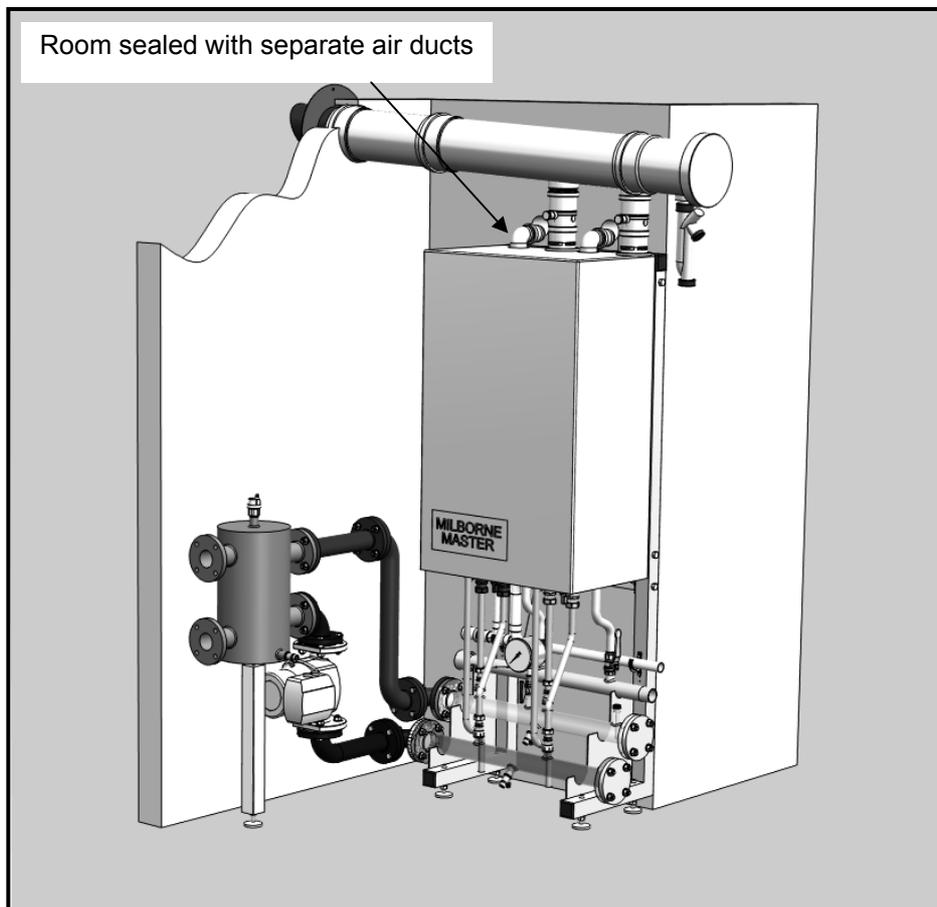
Single boiler arrangement showing frame, flue header, water pipework and primary circuit pump kit
